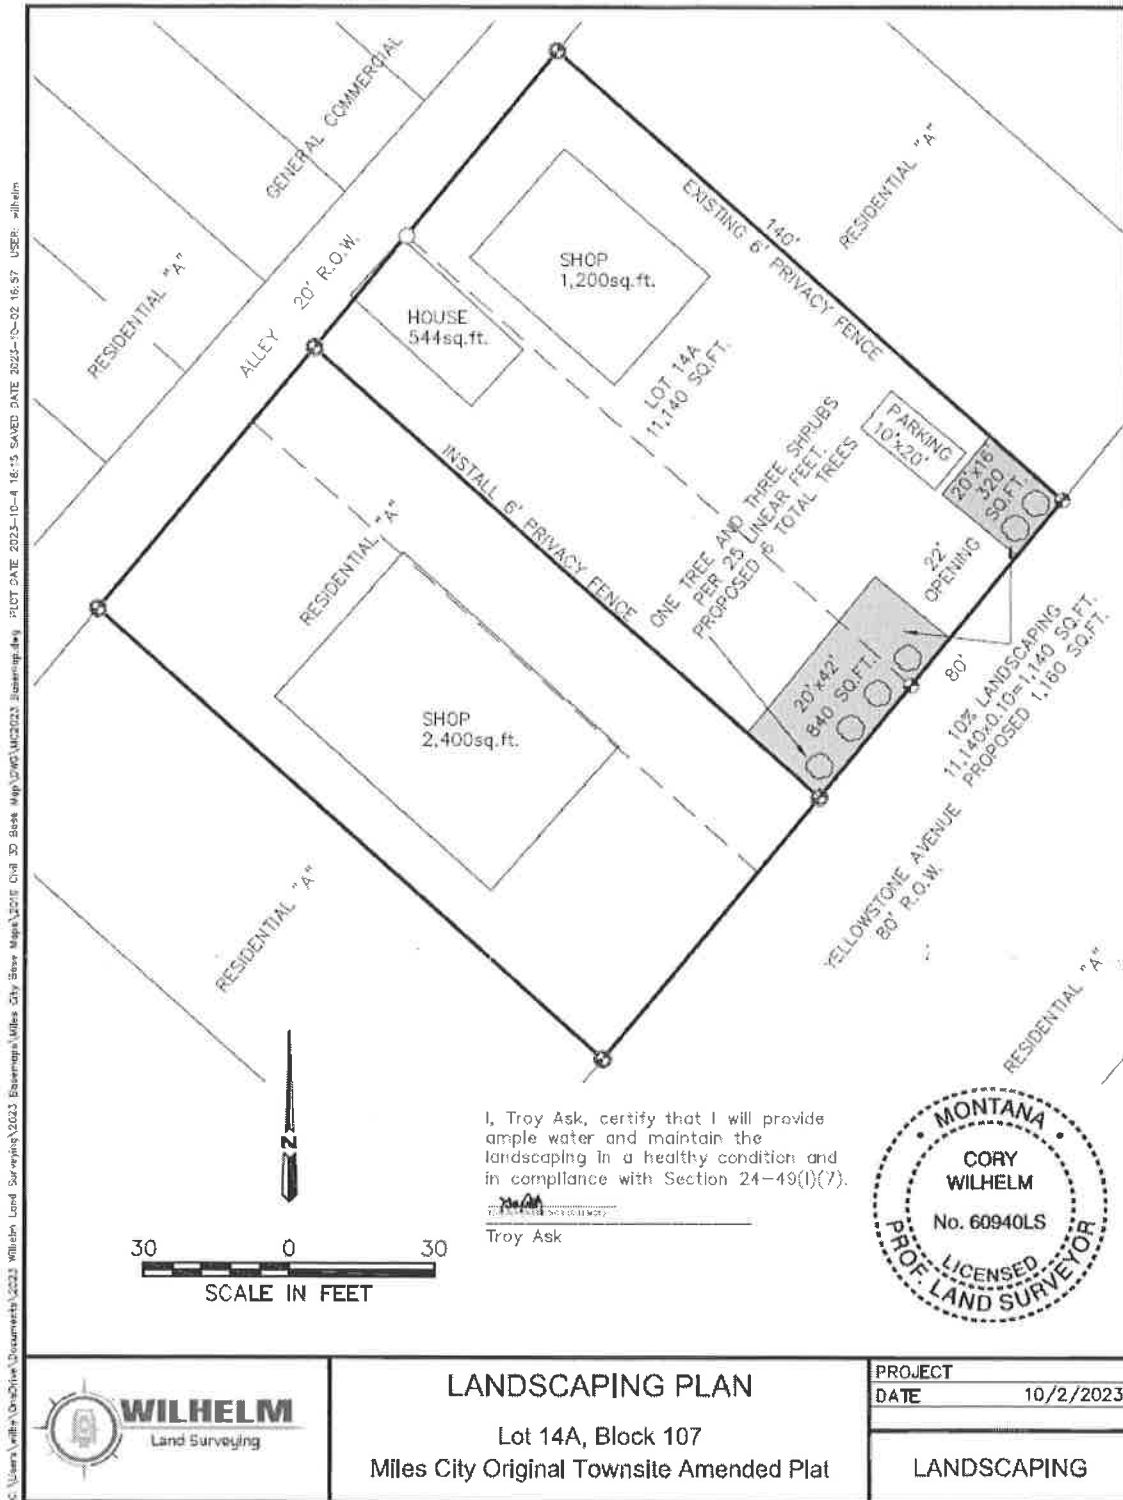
is a proposed landscaping plan for Lot 14A, which is further discussed in the following section of this report.
